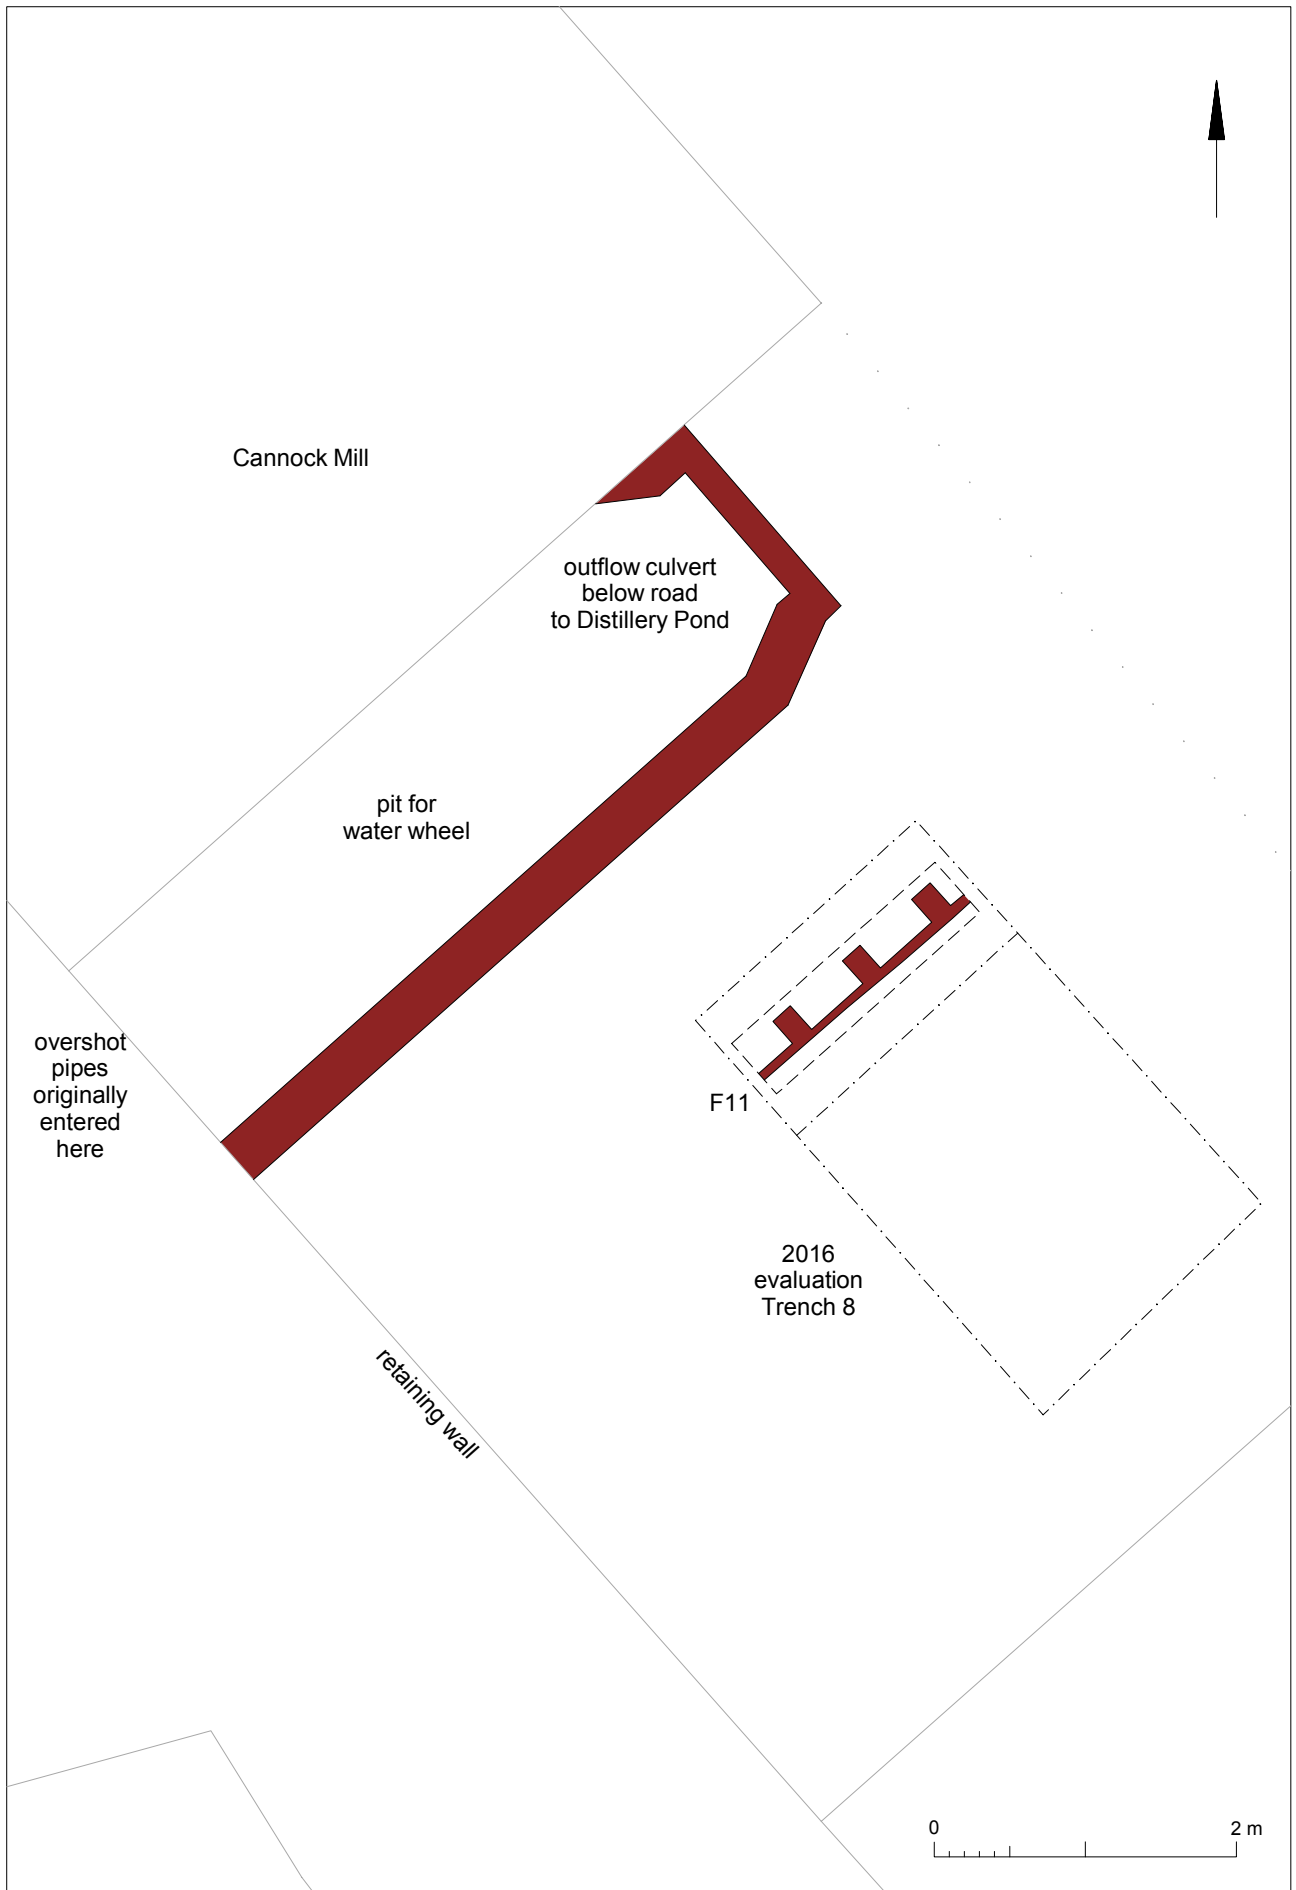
Pit for water wheel uncovered during groundworks in 2017.
